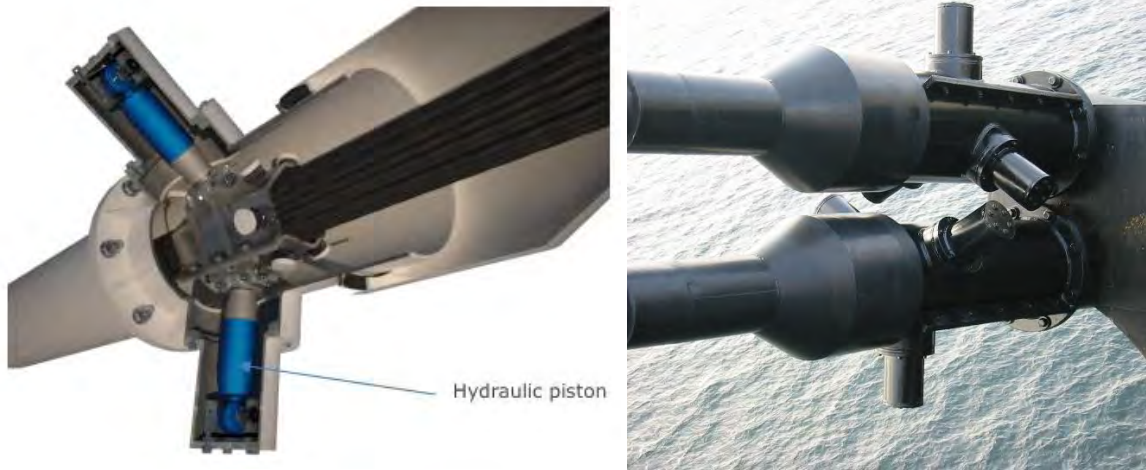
Hydraulic stay cable damper (Freyssinet IRD type). Cross section view (left). External view twin stay cables, Øresundsbron [right].
